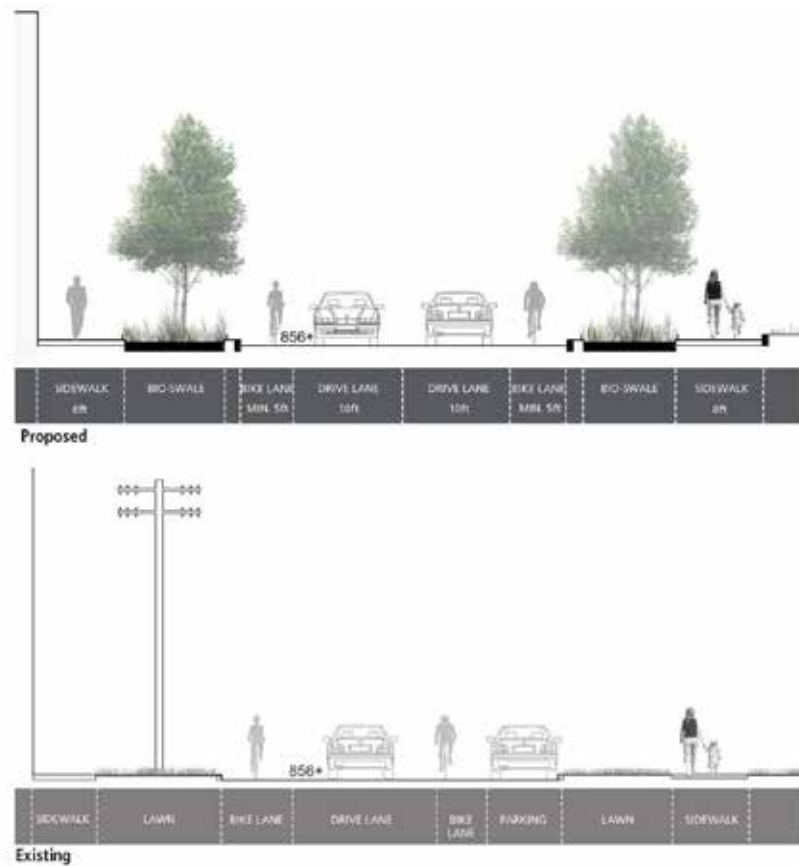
Existing and Recommended N. Charter Street Cross Section
